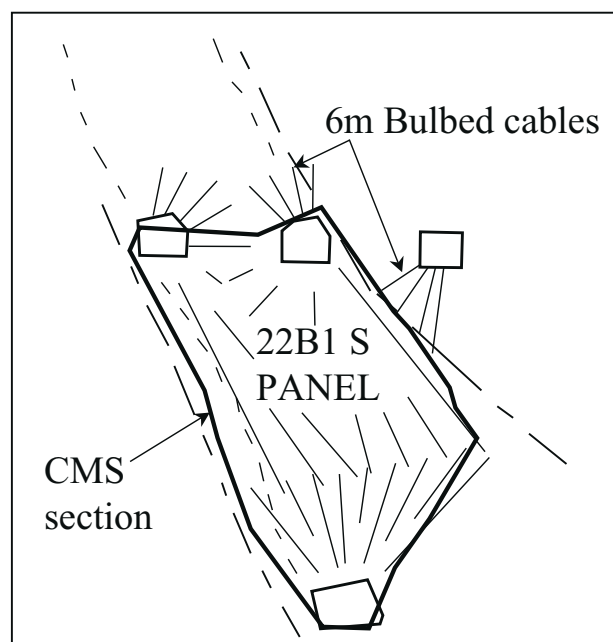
Stope hangingwall cablebolting from a remote drive (Villaescusa *et al*, 1995).
